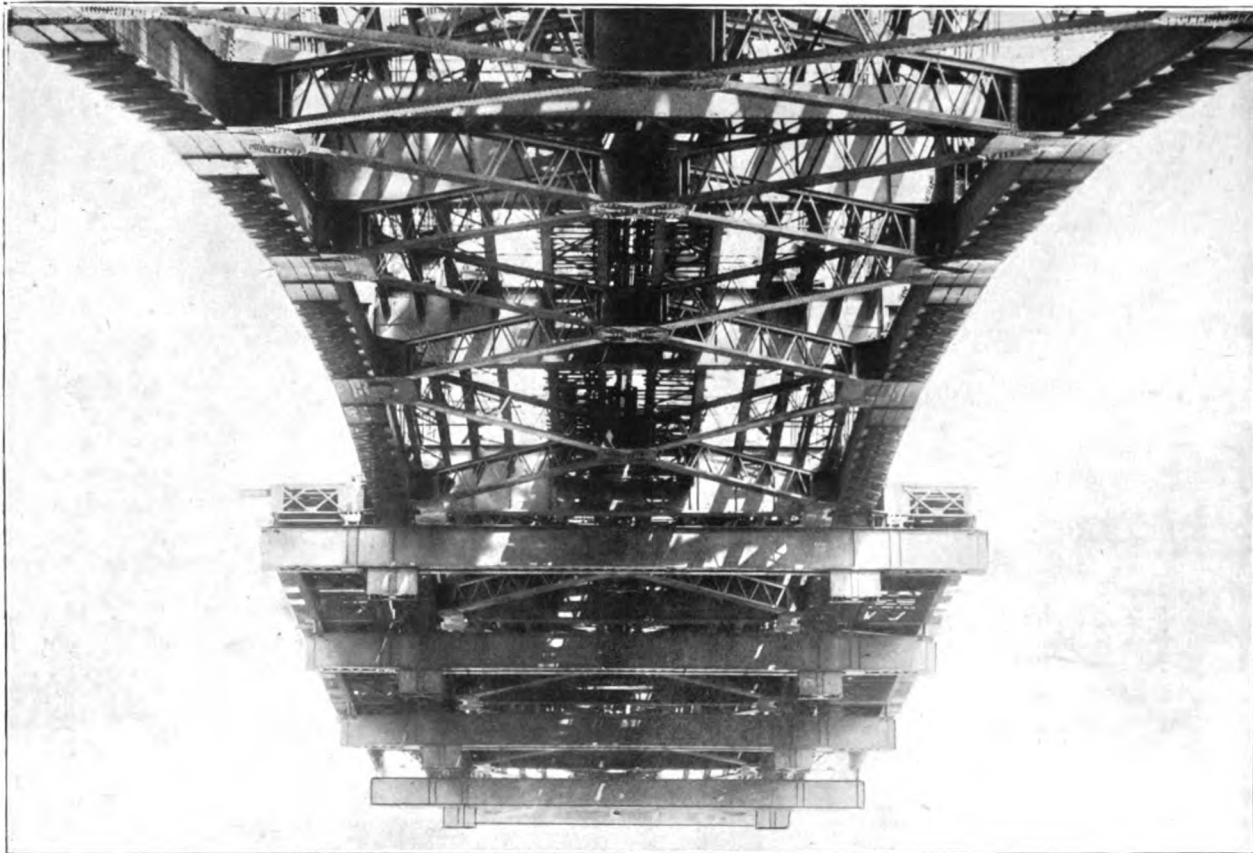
VIEW OF UNDERSIDE OF CANTILEVER, LOOKING FROM SOUTH MAIN PIER.
